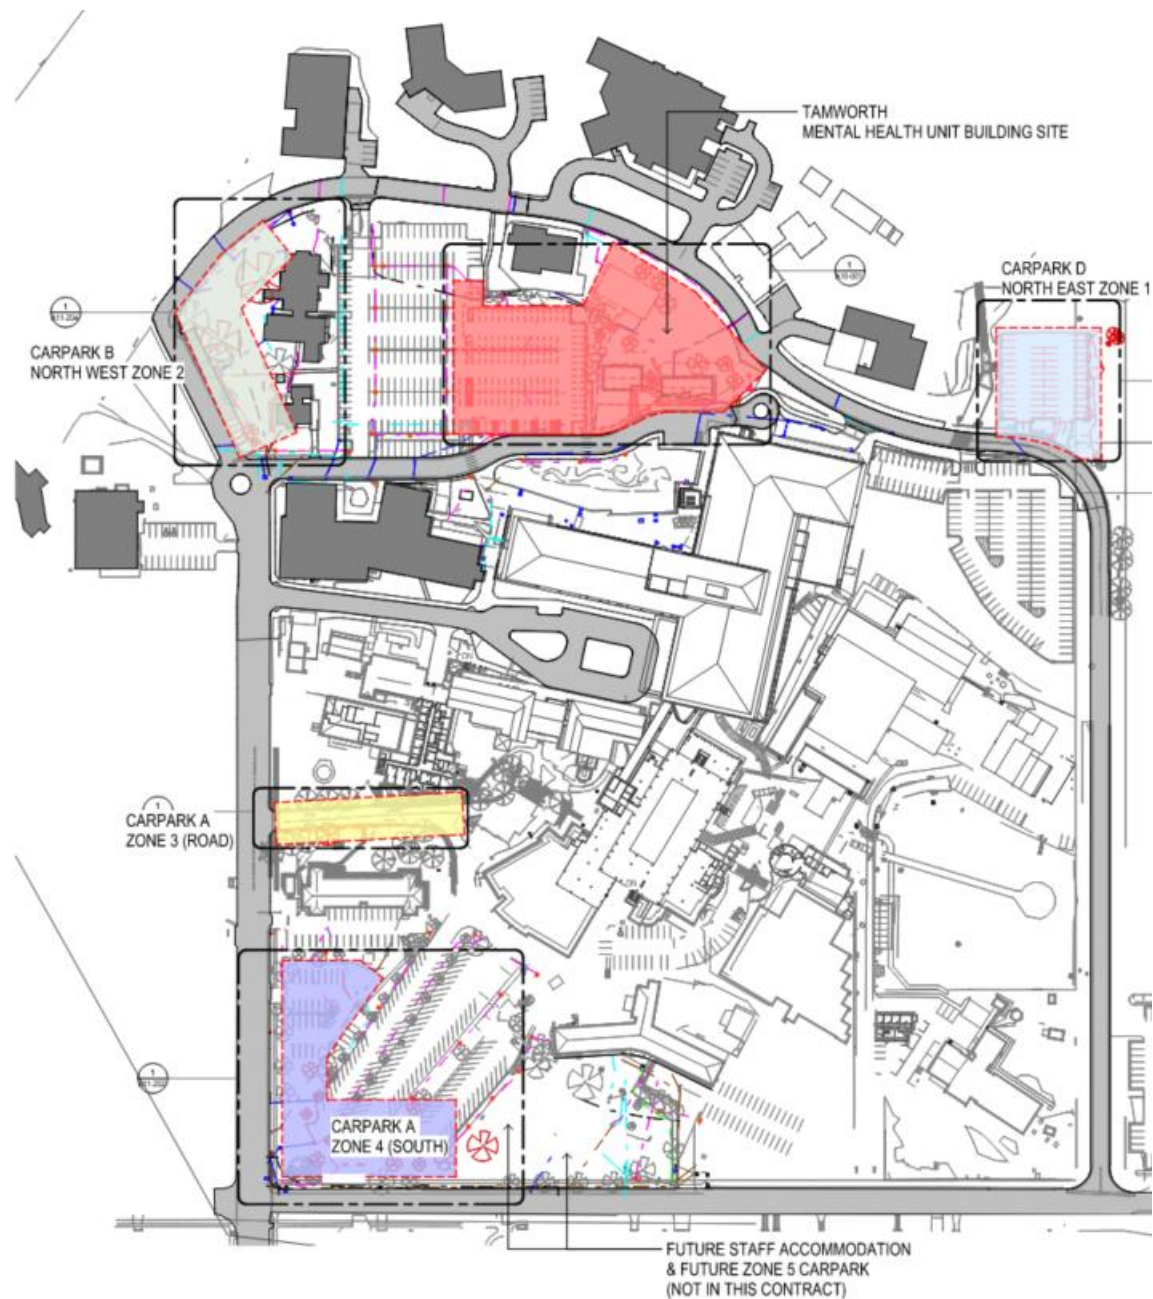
Overall Site Plan Extract from Architectural Drawings A10-100
